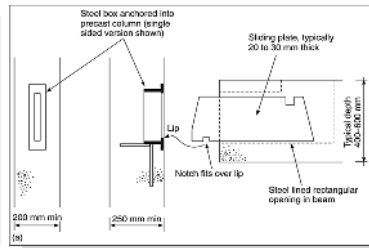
Sliding plate beam-to-column hidden connection in detail.
